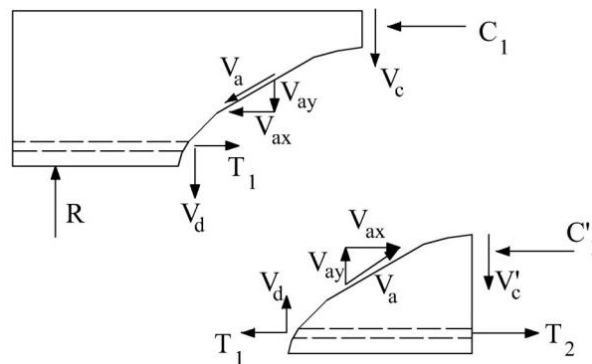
Equilibrium of forces in a cracked beam/one-way slab
